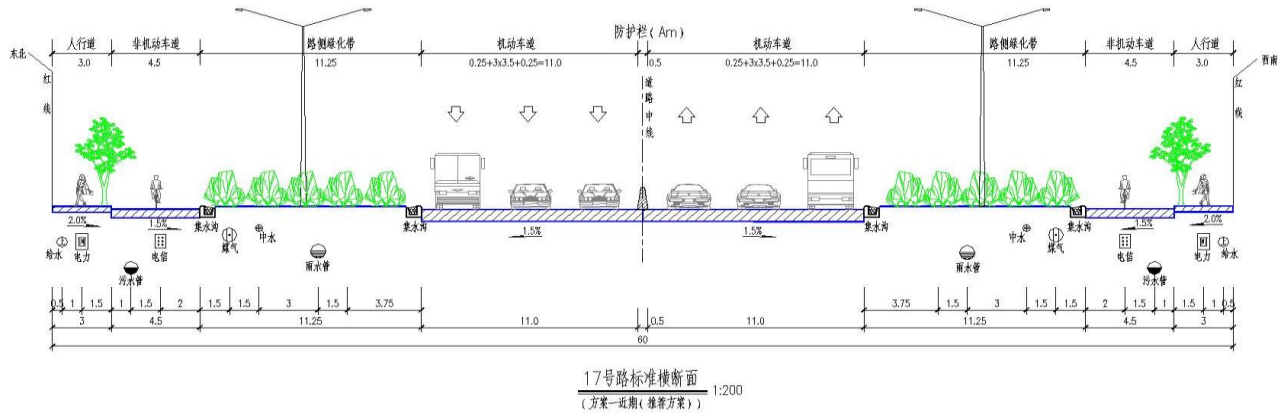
Cross-sections of No. 17 Roads in Chuxiong 3
